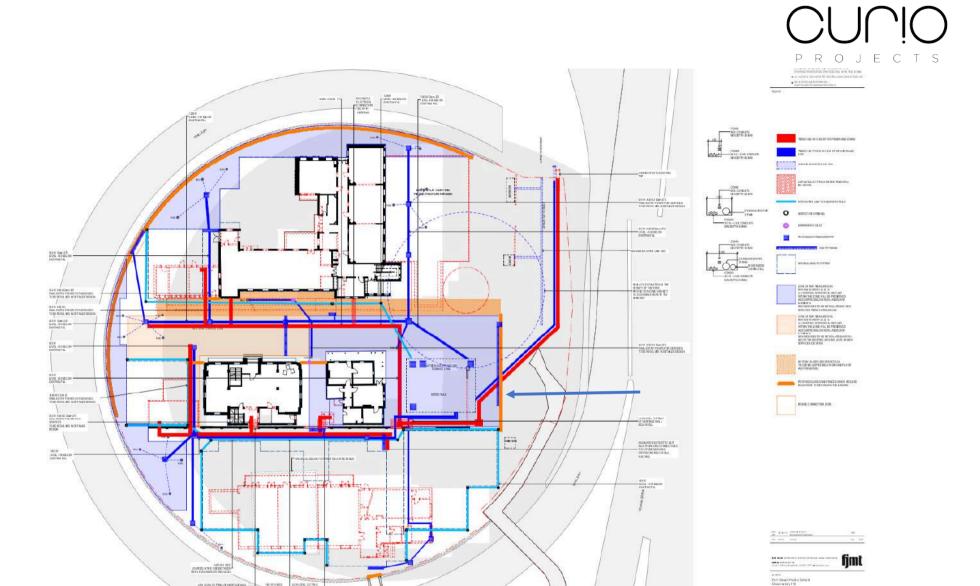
Proposed Services Plan over Demolition Plan. Water Tanks shown as white rectangle (indicated) (Source: FJMT DWG DA-2105, 18.12.19)
